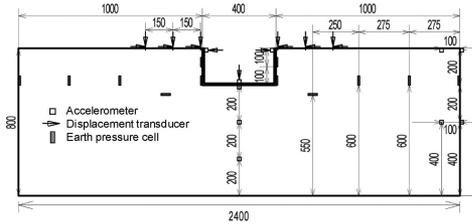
Elevation view of the test pit and positions of test equipments (Case A).
